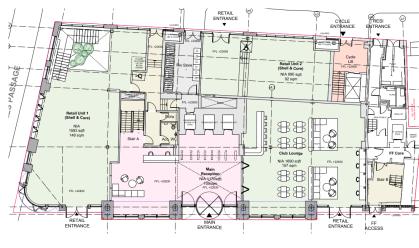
Ground Floor Plan (courtesy of Buckley Gray Yeoman)
